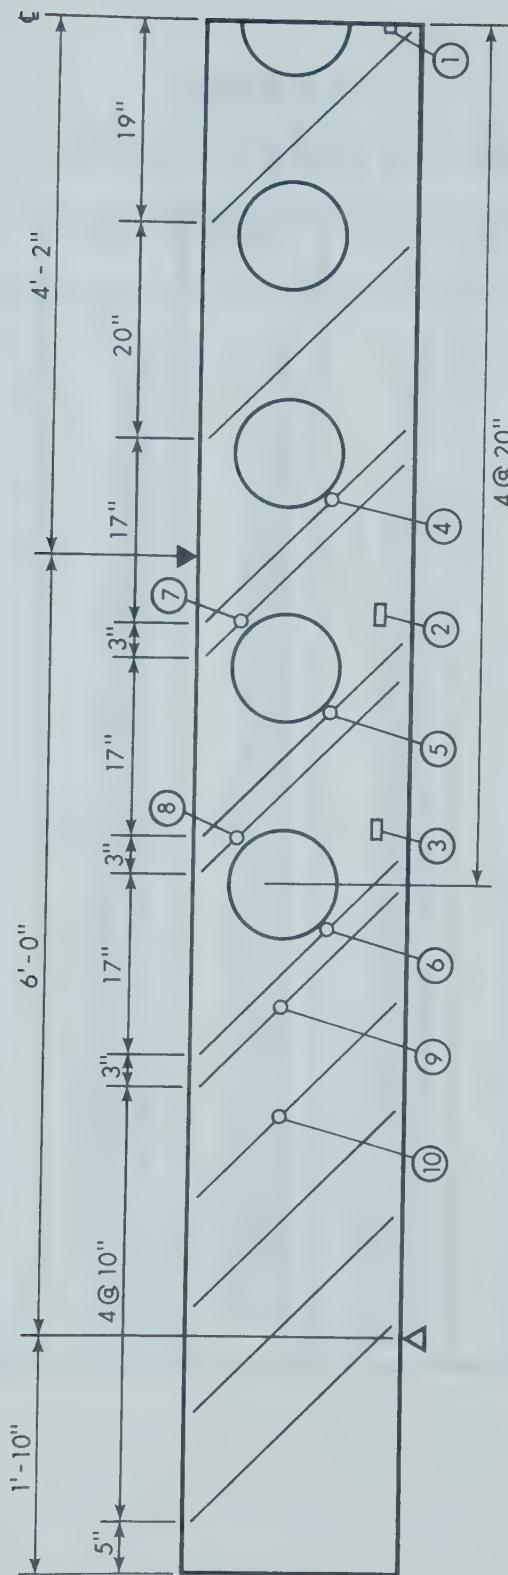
BEAM AD-3 REINFORCEMENT AND GAUGE DETAILS
